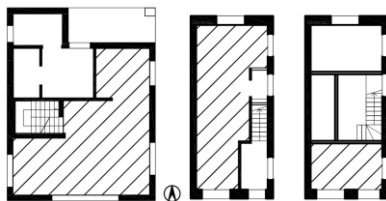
Left side: Single family house, ground floor plan (GF). Middle: townhouse unit GF. Right: side: First floor, townhouse unit. Zone analysed for overheating marked with lines: ground floor (GF=living room, dining area, kitchen) and bedroom in the townhouse).
